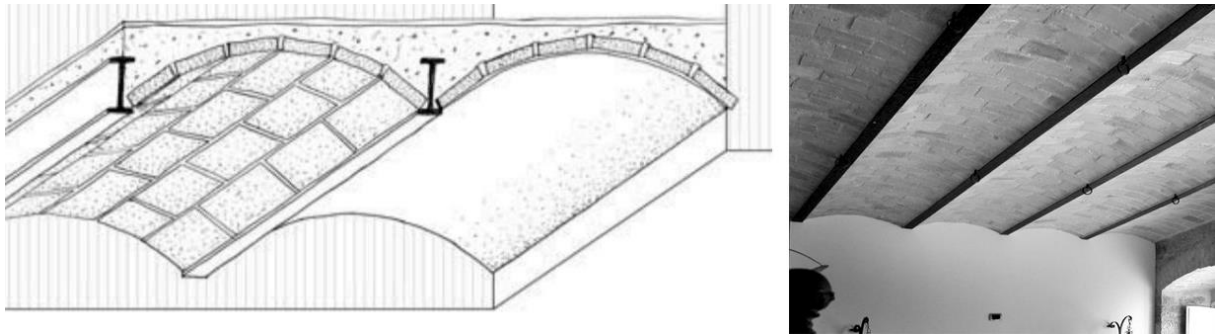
Jack arch slab supported by iron I-beams, (a) 3D drawing of the slab, (b) image of the slab
